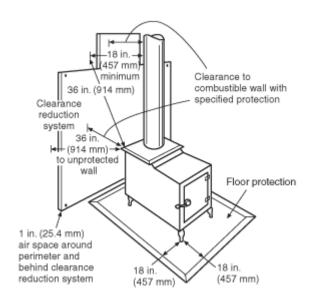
(b) Distance to Combustible Wall/Floor.
